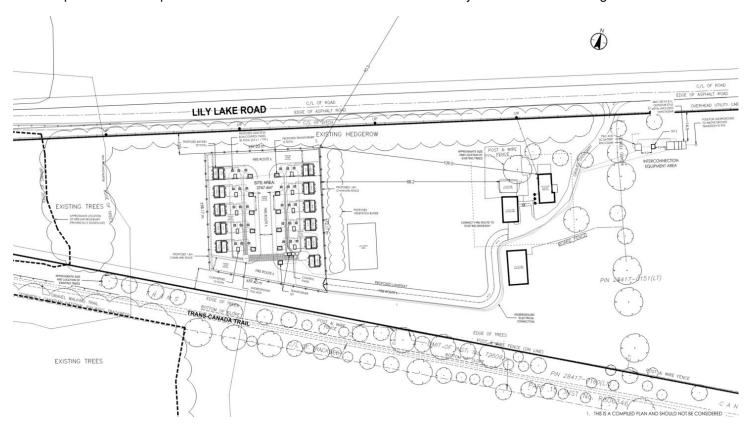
Preliminary Site Plan of the proposed BESS facility. The site is located to the west of the existing dwelling between Lily Lake Road and the Trans Canada Trail.
